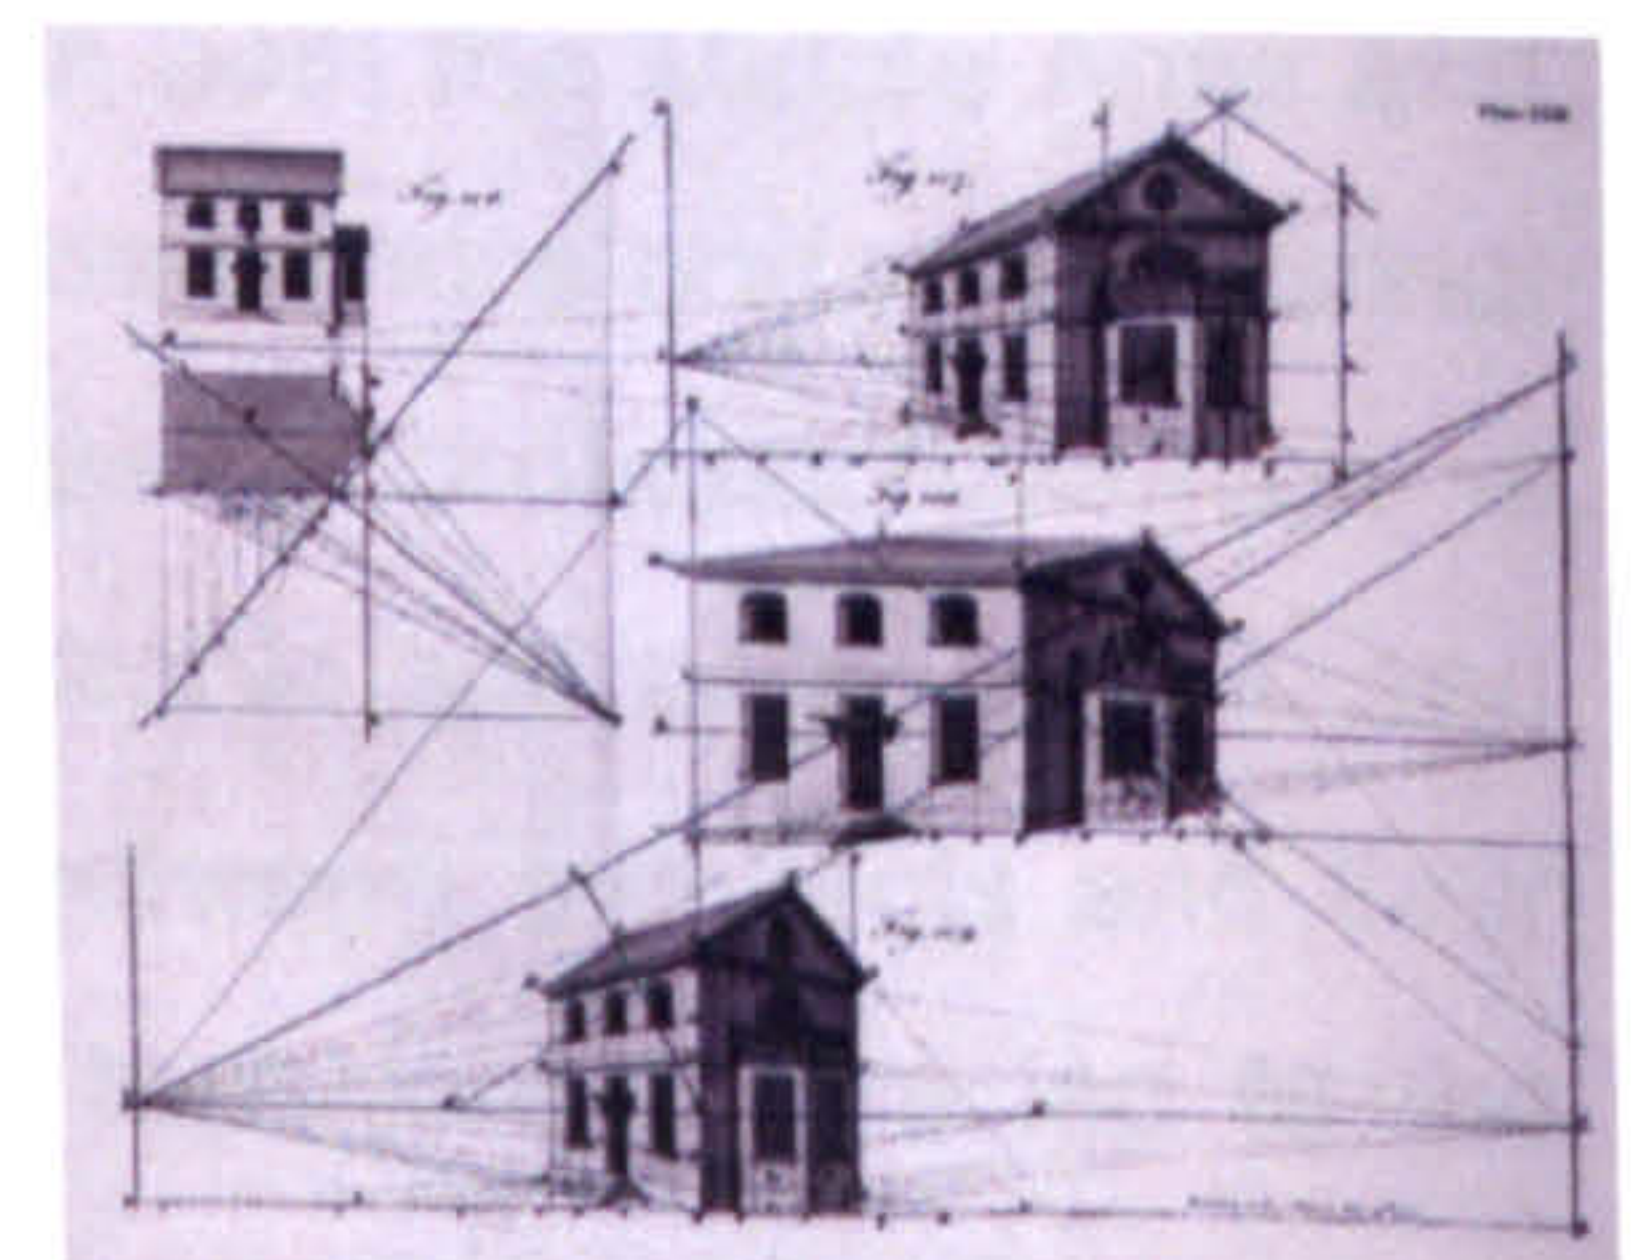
Plan, Elevation, and three Perspective views of a house engraving, (1776). Blau and Kaufman (1989: 191)
